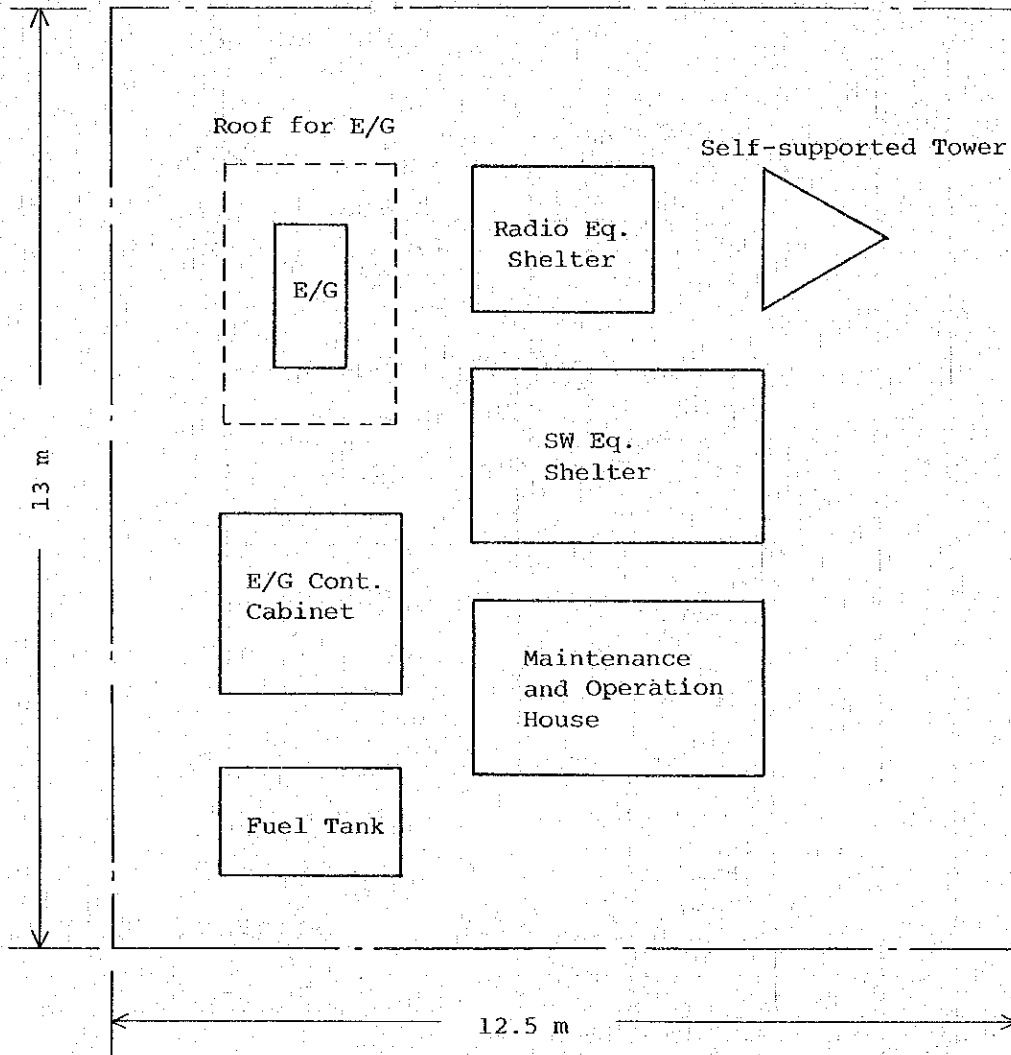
(3/5) Typical Site Layout Plan for Exchange with Commercial Power Supply System and Self-supported Antenna Tower
